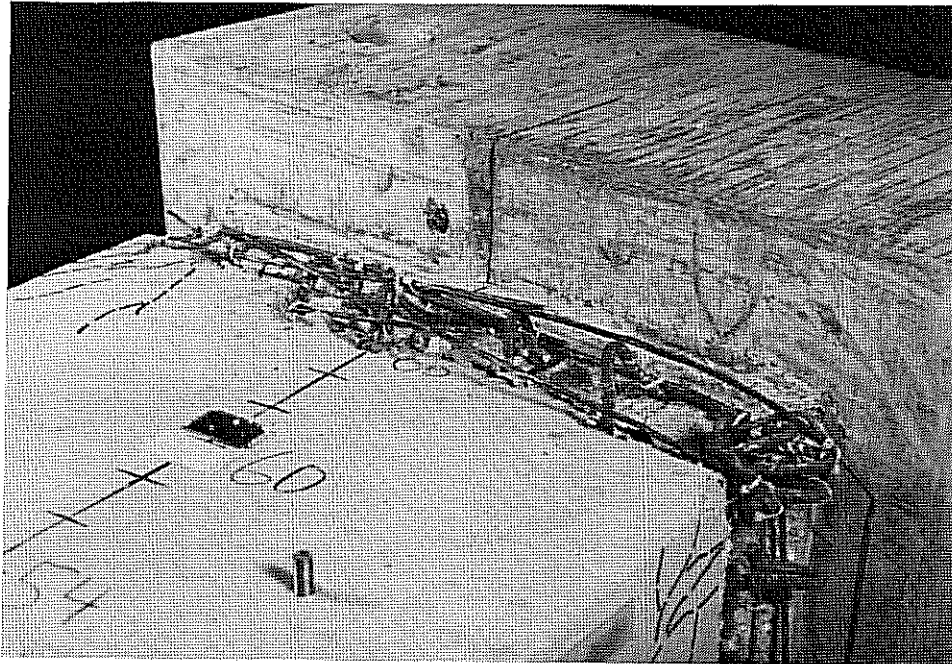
Specimen 8ML25 Side Face Close-Up
